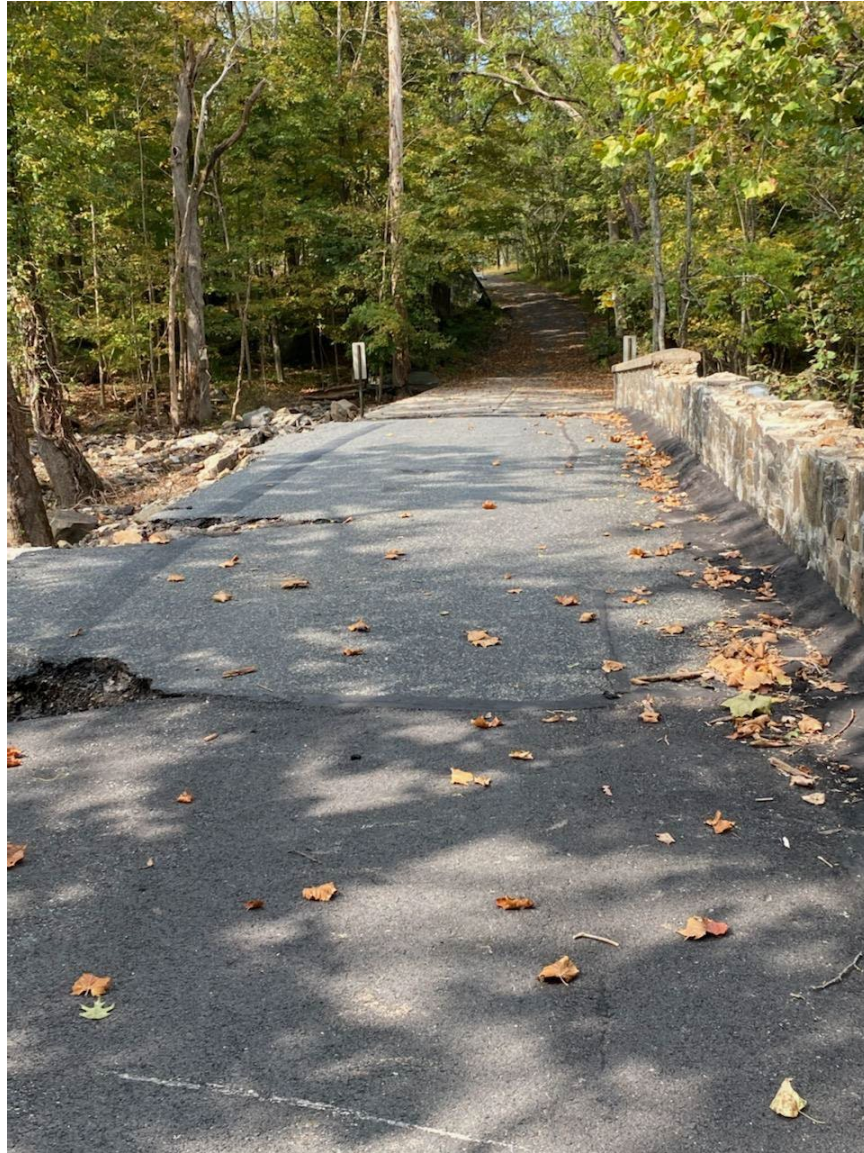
Price Rd Bridge View of Roadway and Damage (40.357866, -75.426465).
